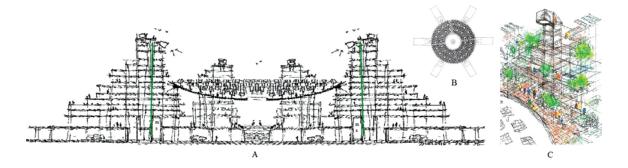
Small heliostats on long-span circular hanging roof over urban open-air plaza with multiple receivers on adjacent buildings.
